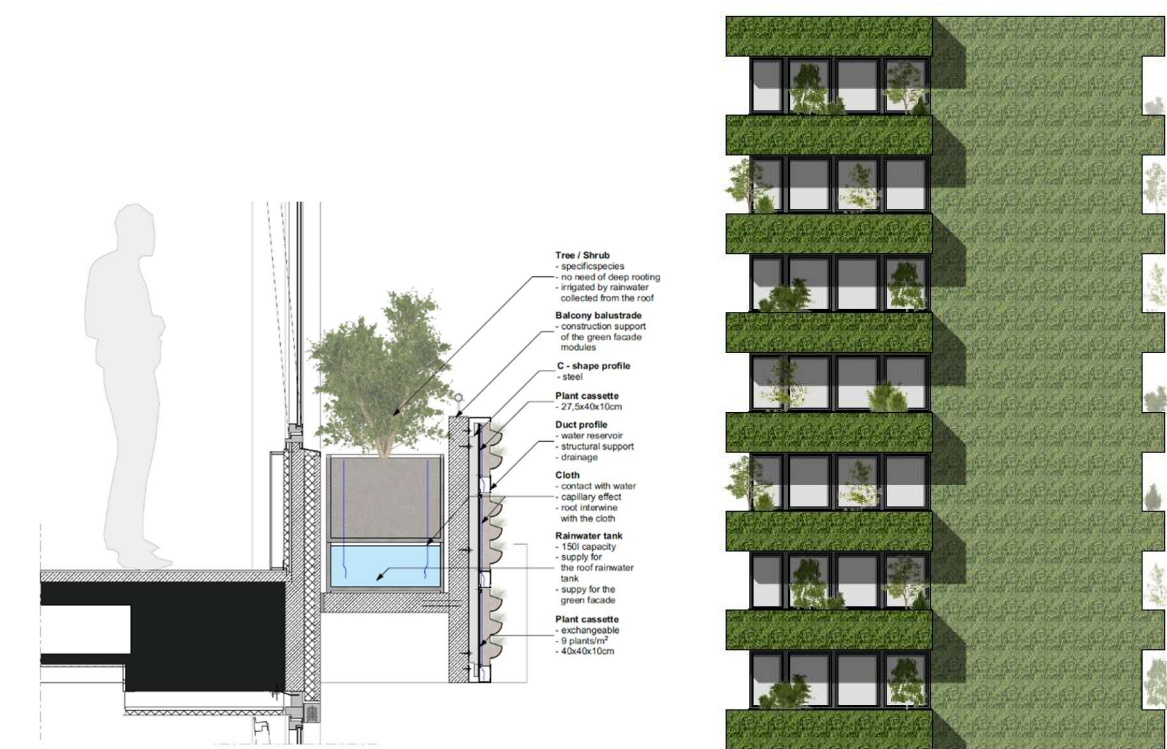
Section detail of a flowerpot system. (Stanislav Rezucha)
